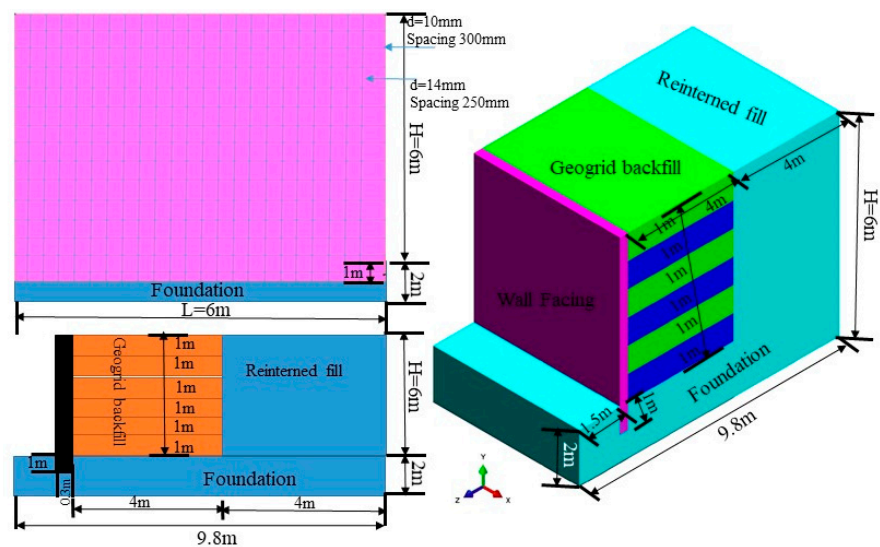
Detailed dimensions of reinforcement concrete MSE wall structural components.
